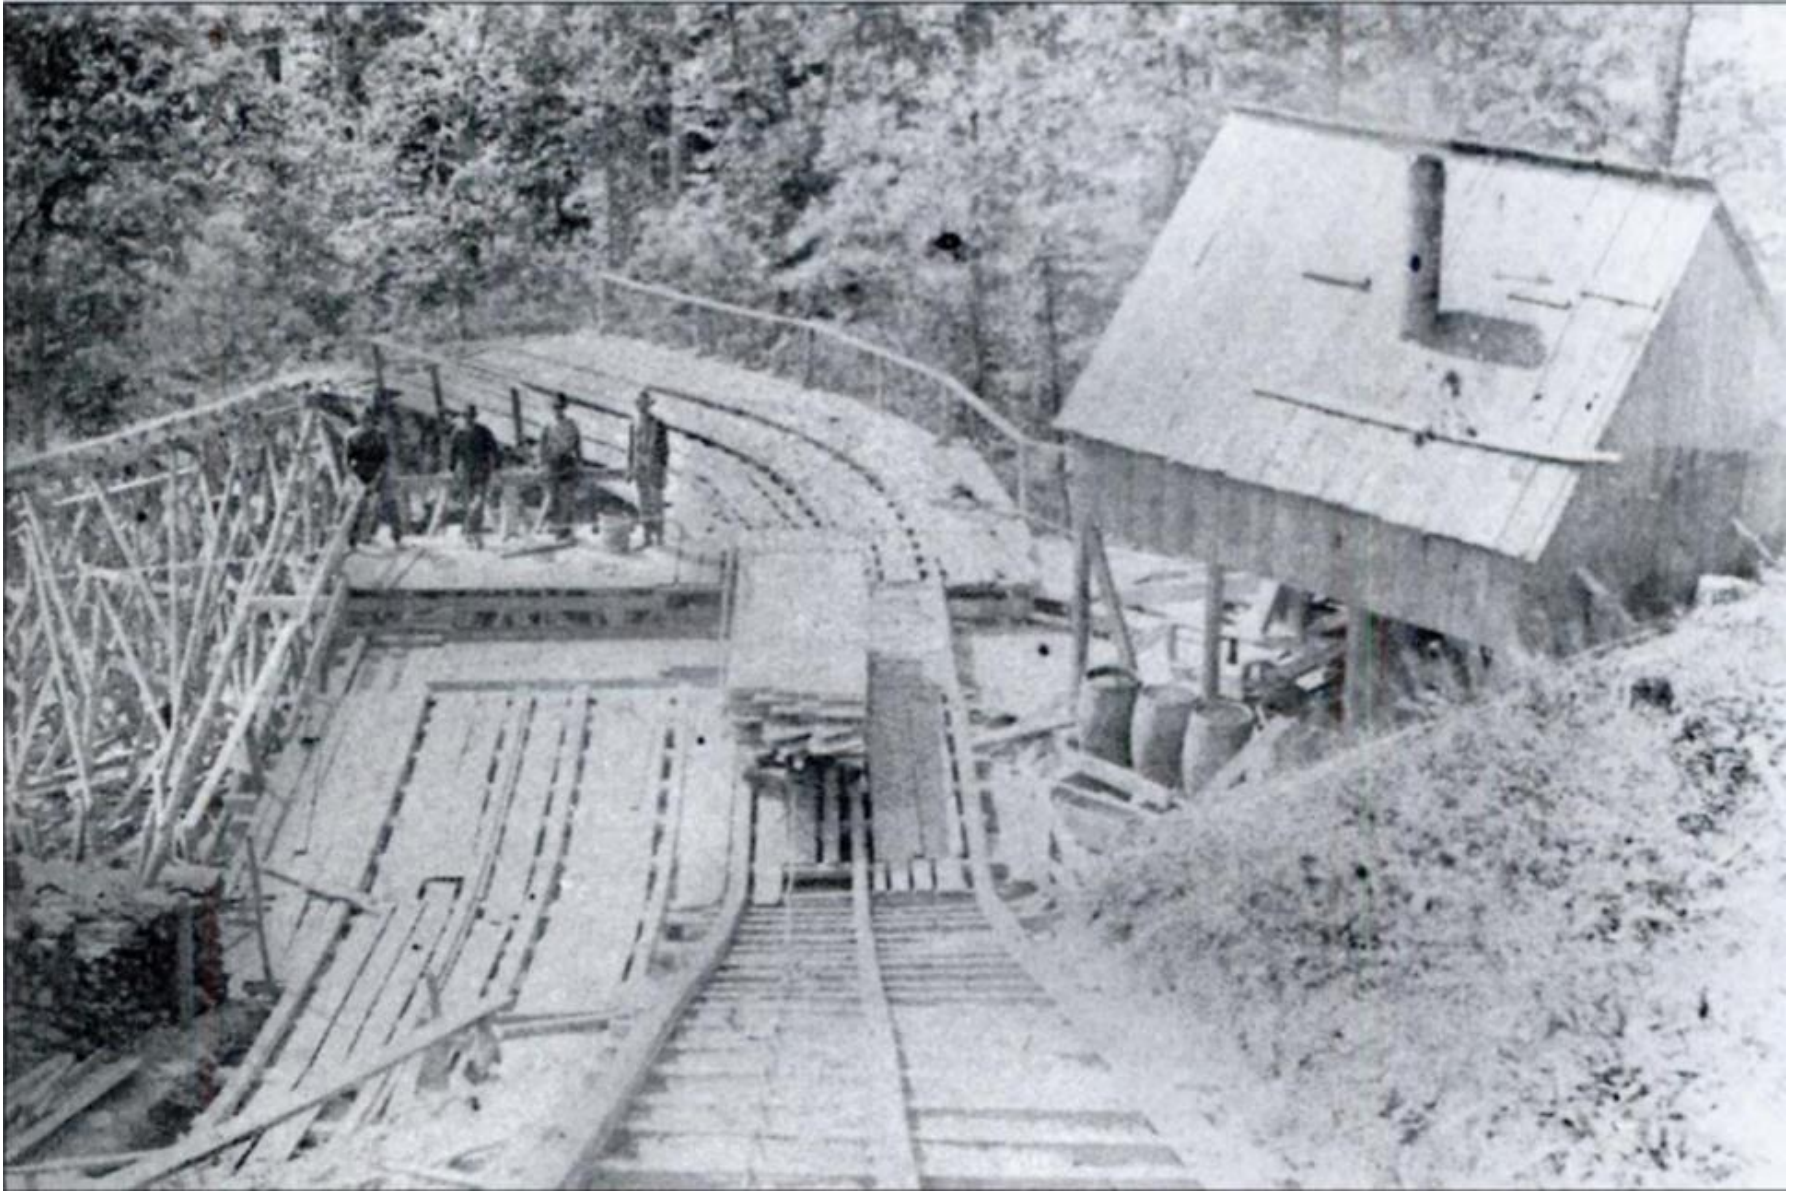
“This shed housed a steam engine generating the power needed to pull cables that acted as a braking or hoist device in the descent and ascent of railcars loaded with lumber. Notice the water barrels beneath the shed and the wooden trestle spanning the ravine on the left. The barrels held water that was used by the steam engine to generate the power to pull on the cables. (Courtesy of Archives of Appalachia, East Tennessee State University.)”³²⁶
